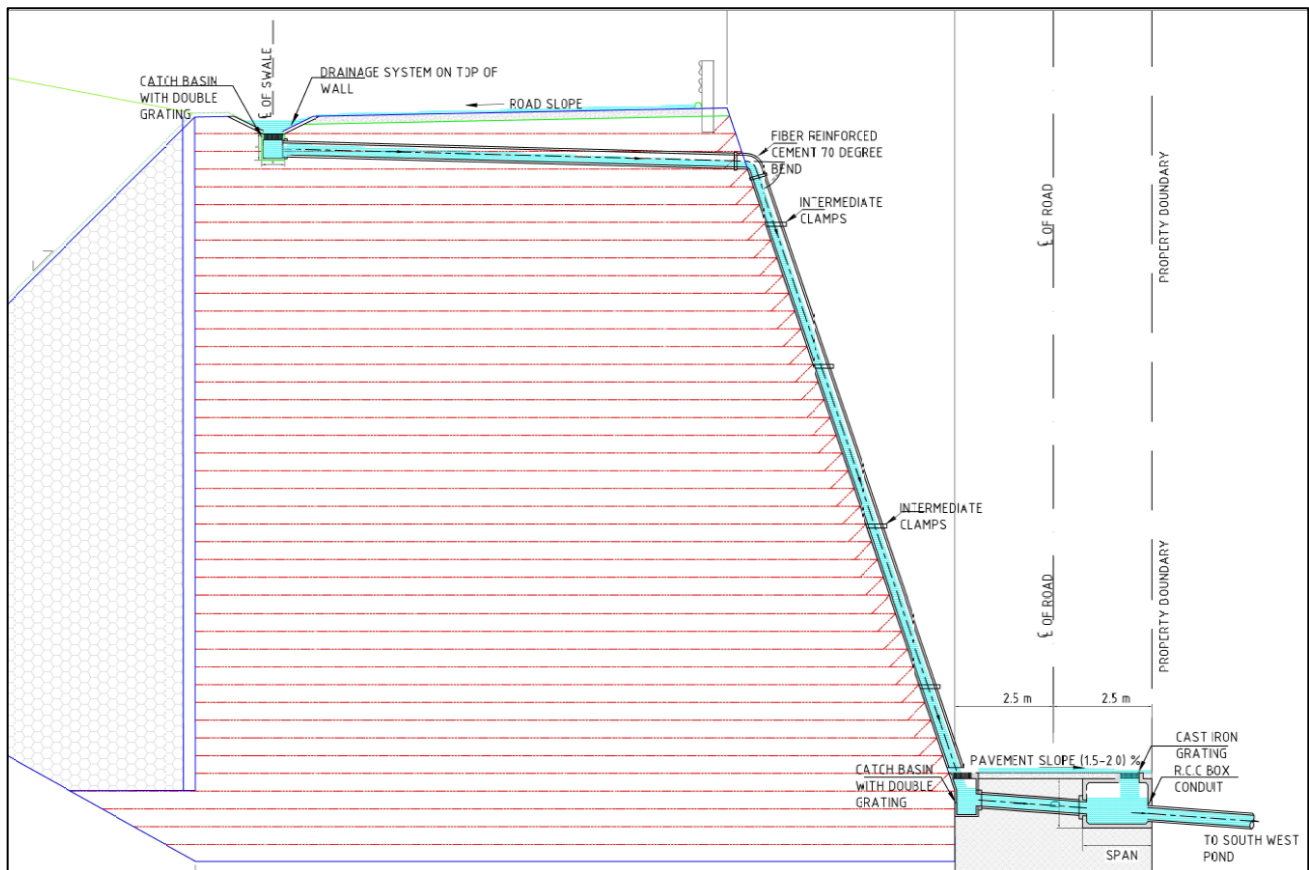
Schematic Layout of Downpipe at Point C, outside wall.
